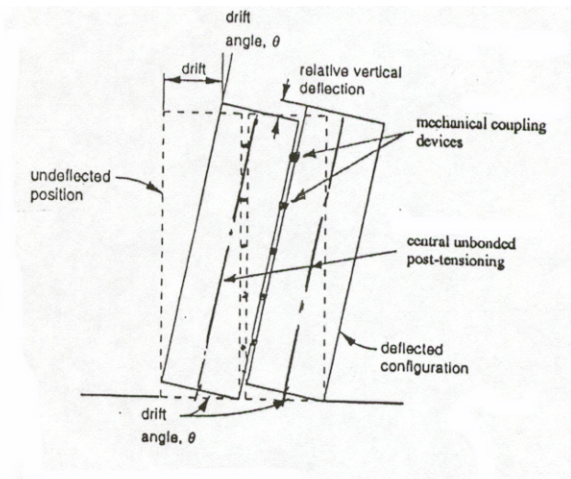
(b) Coupled wall test module with vertical mechanical couplers.
